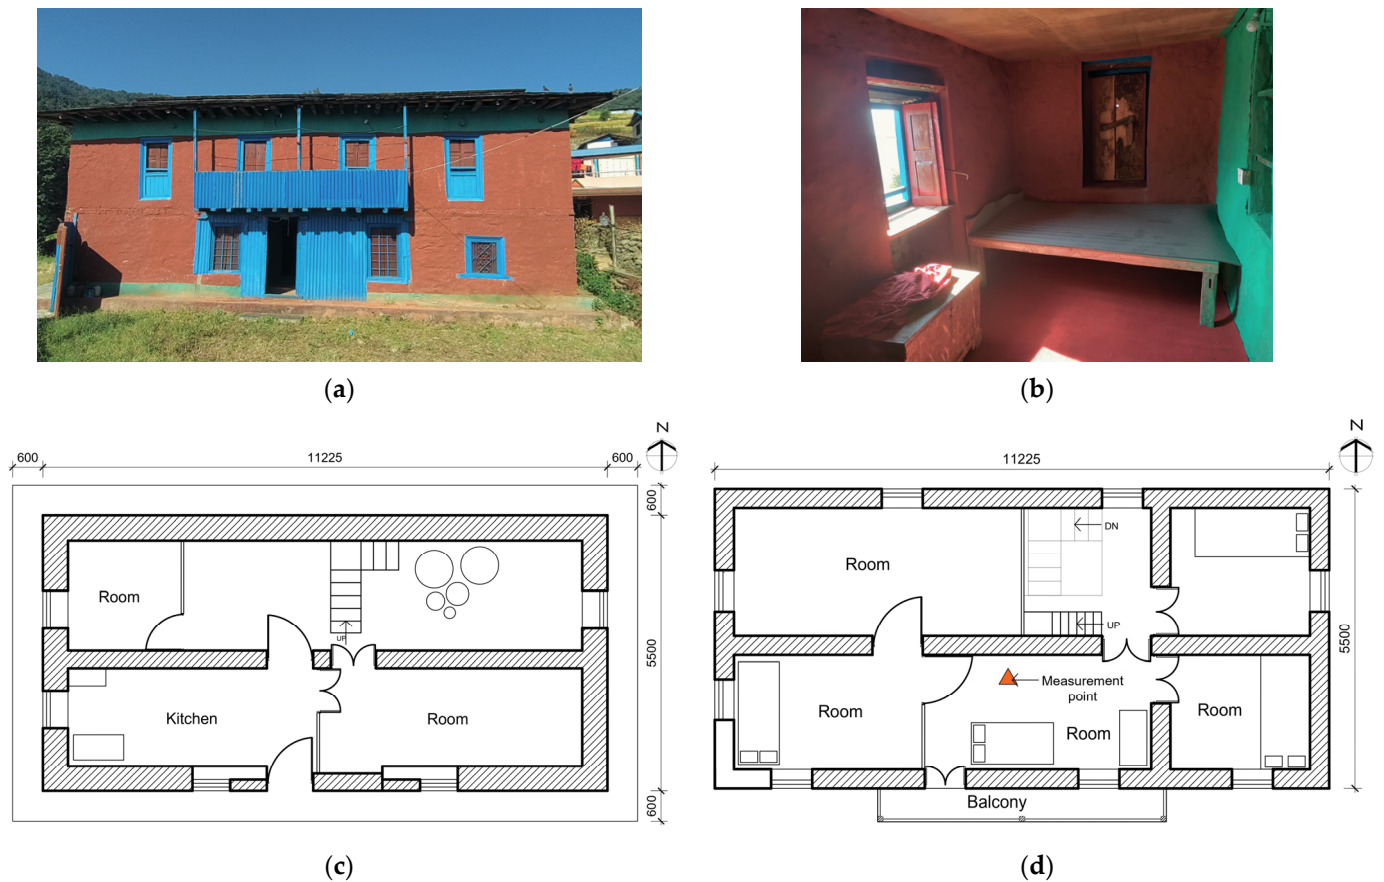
Exterior view, interior space of the vernacular house in Jillu: (a) Exterior view; (b) Interior spaces; (c) Ground floor plan; (d) First-floor plan.
